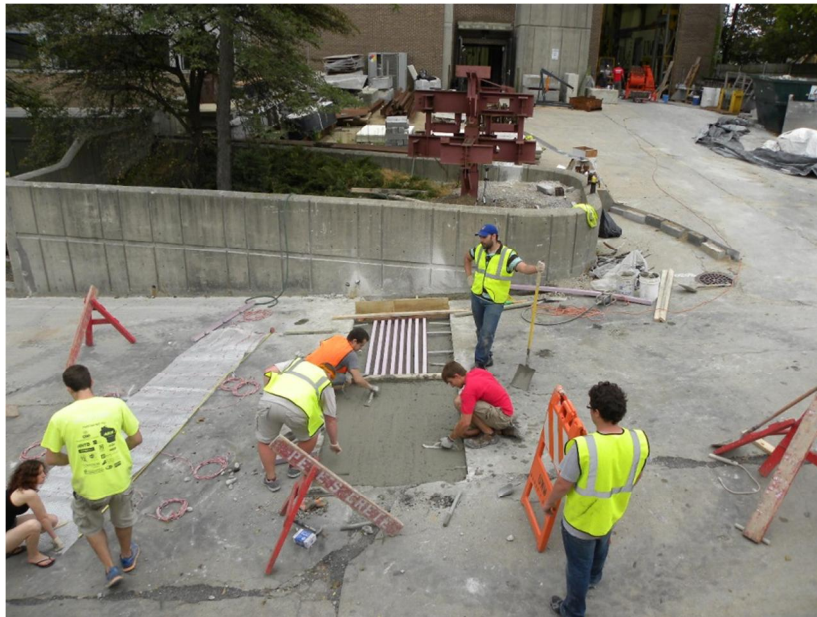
Placing (bottom of picture) and mixing (top right of picture) of SECC
